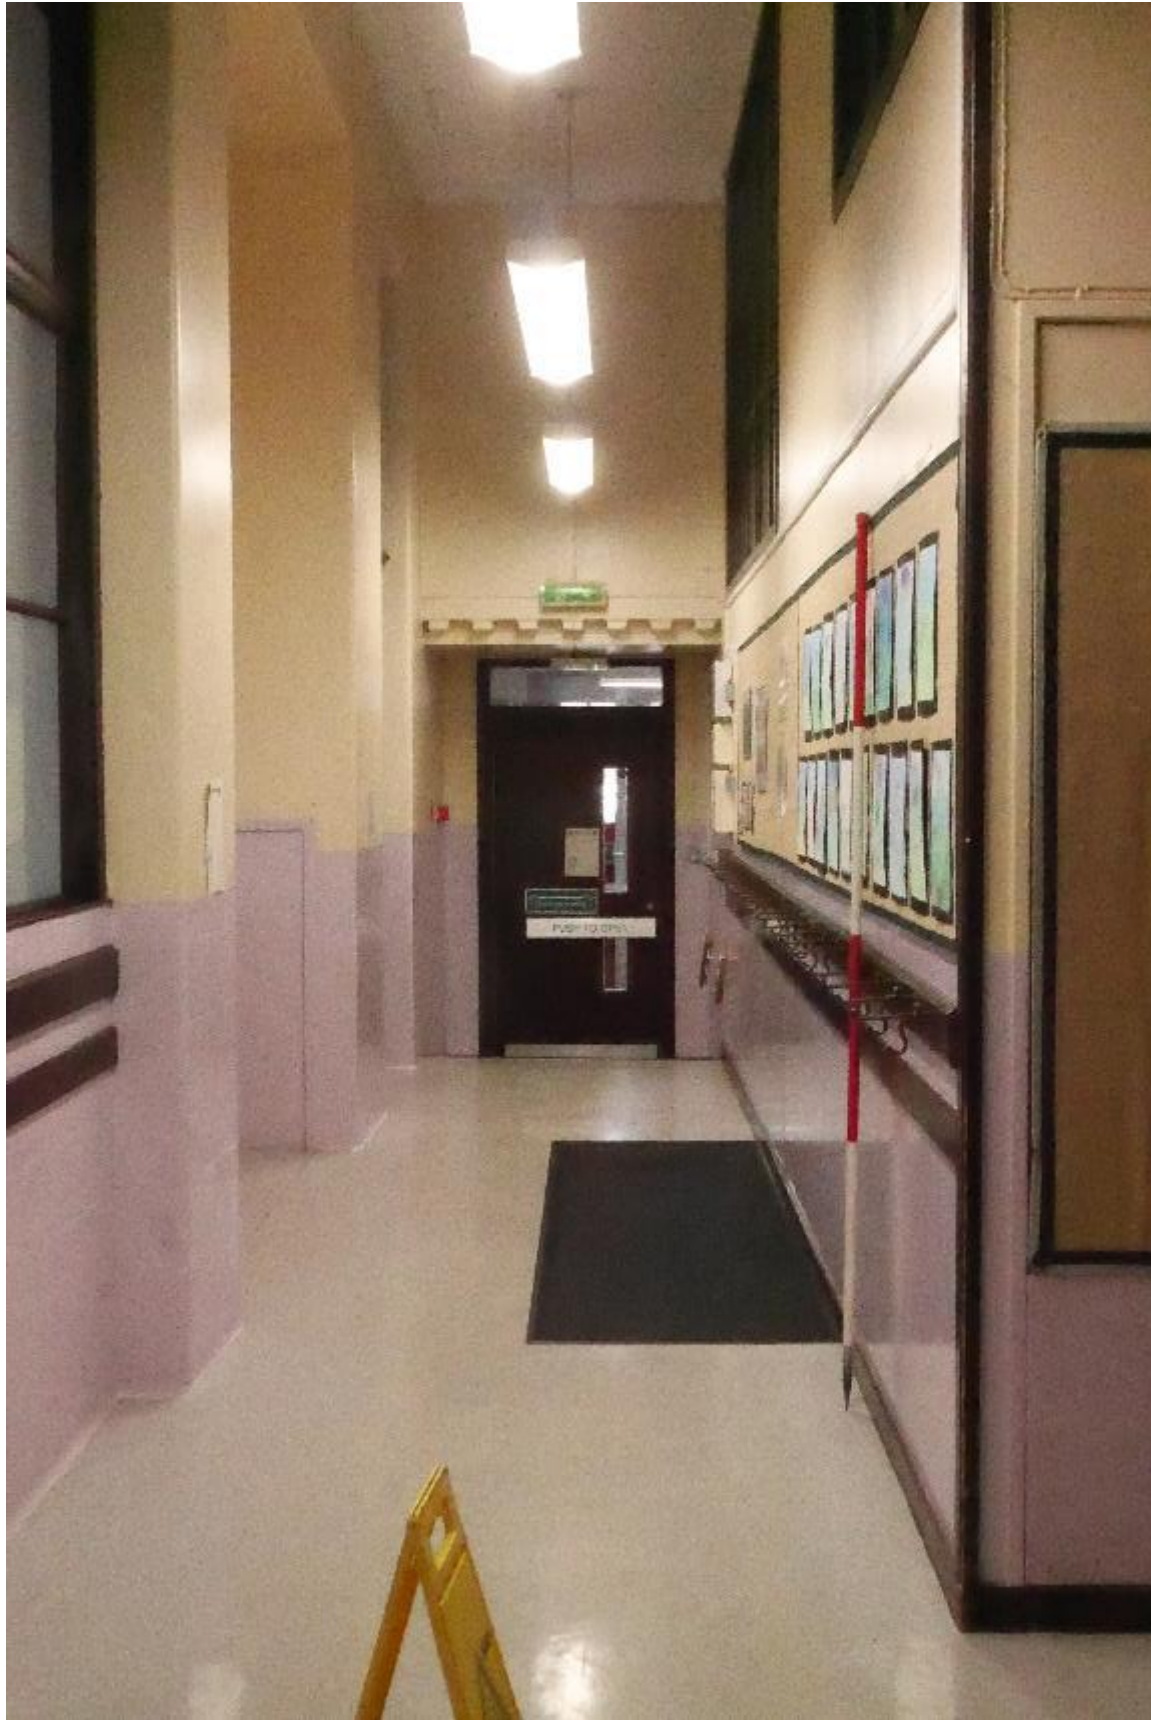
Corridor (1) at Western end of school building looking towards entrance, wooden coat rack visible on wall to right. Entrance doors into Dining Hall (2) on left.
